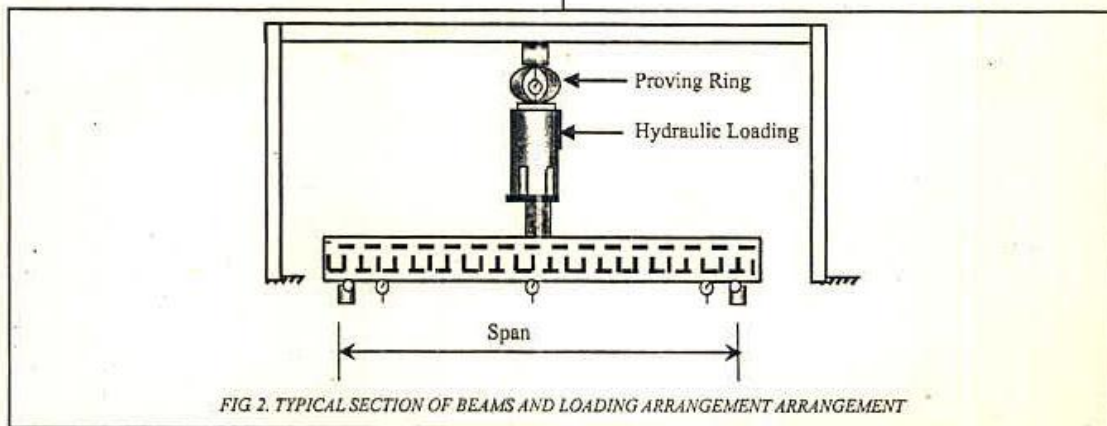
TYPICAL SECTION OF BEAMS AND LOADING ARRANGEMENT ARRANGEMENT
